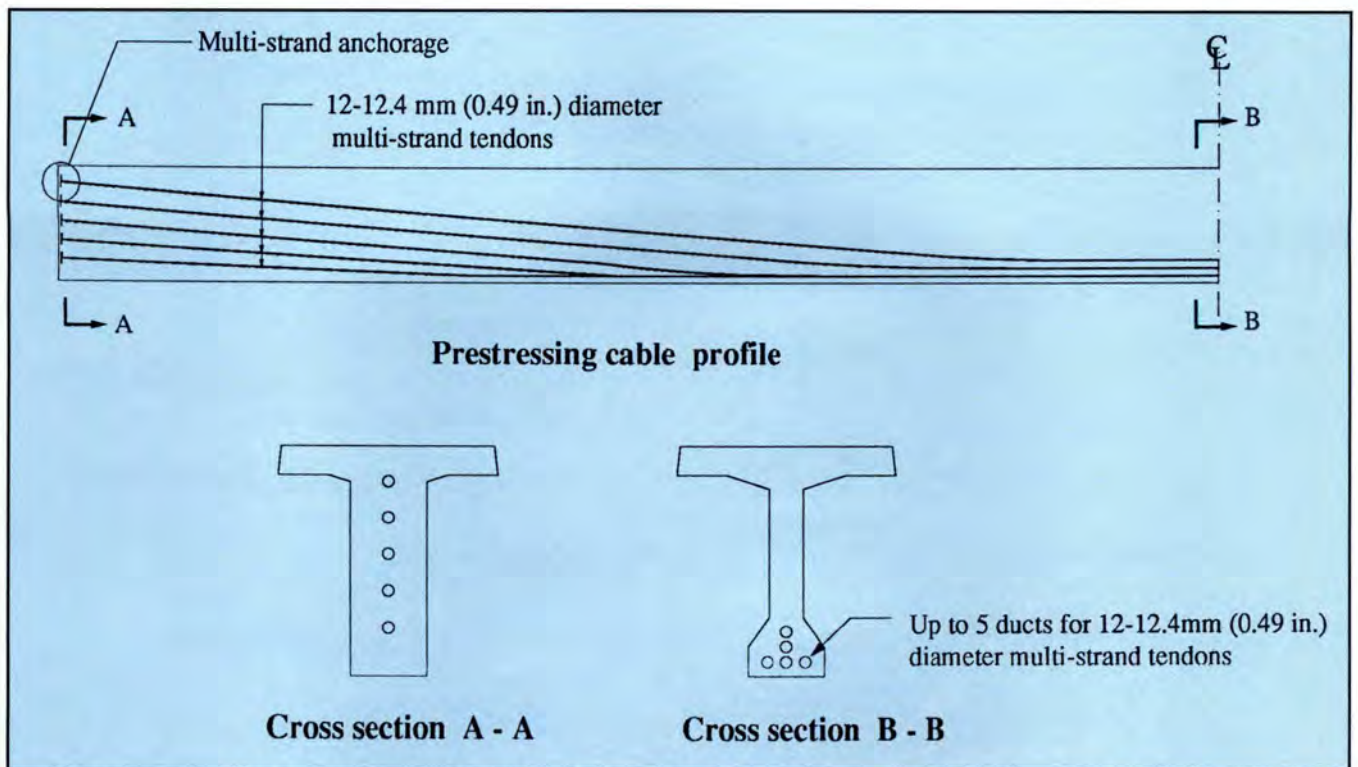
Prestressing cable profile for post-tensioned T-girders. Note: Standard span is 28 to 40 m (92 to 131 ft).
